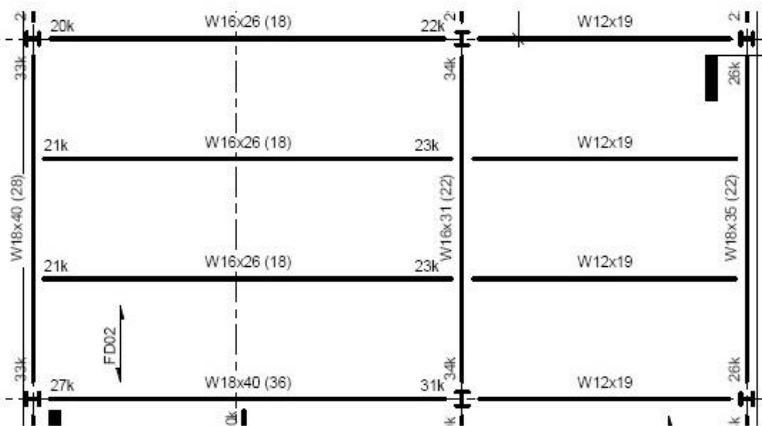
Typical bay layout for building wing. Detail courtesy of Cannon Design.
